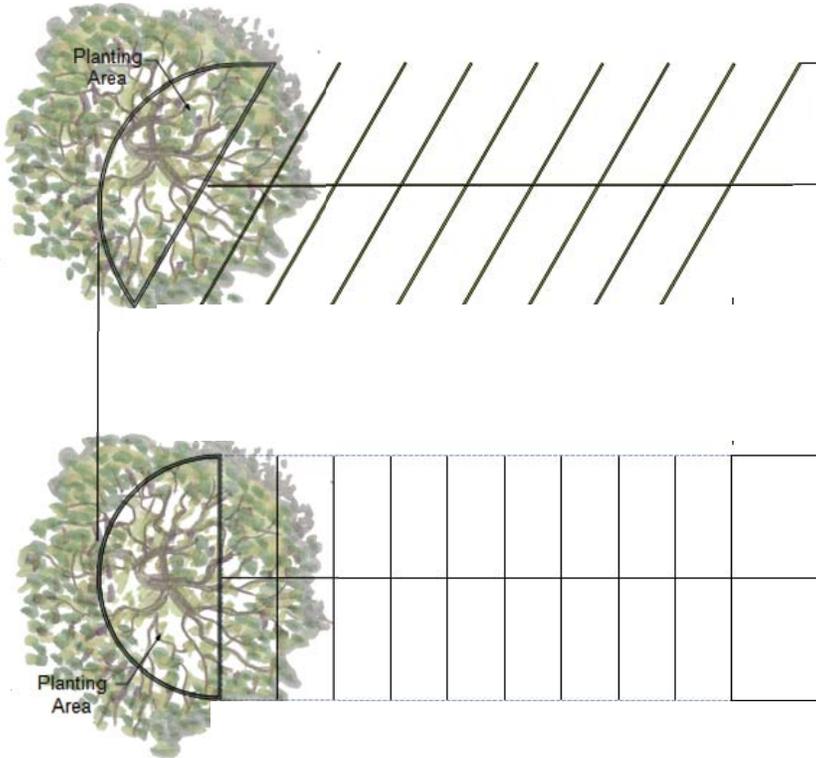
shows a comparison between angled and perpendicular parking. It demonstrates the wider aisles and necessary turning radius needed when parking and perpendicular stalls and the minimum aisle width. As stall width decreases, aisle width increases. Perpendicular parking is more difficult when aisle widths are not wide enough. Other stall angles are used less commonly. For example, a 45-degree angle can provide stall space in a narrow lot because stall-to-curb dimensions and aisle widths decrease with angle of stall.
